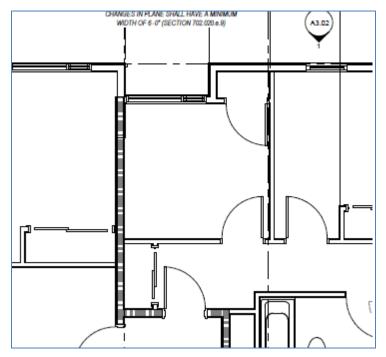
Floor plan detail from 2<sup>nd</sup> floor of Building H
